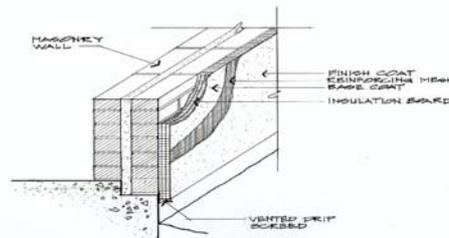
Mass Storage Wall Design EIFS with Masonry Substrate
